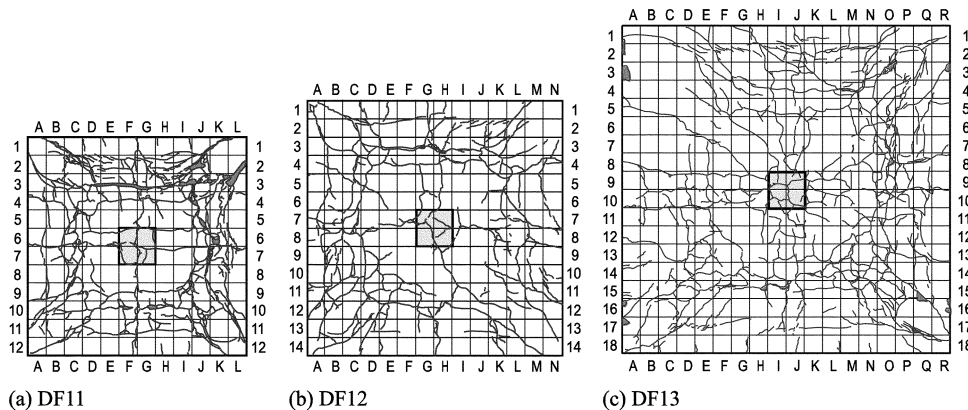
Crack patterns of Footings DF11 to DF13 after failure.
